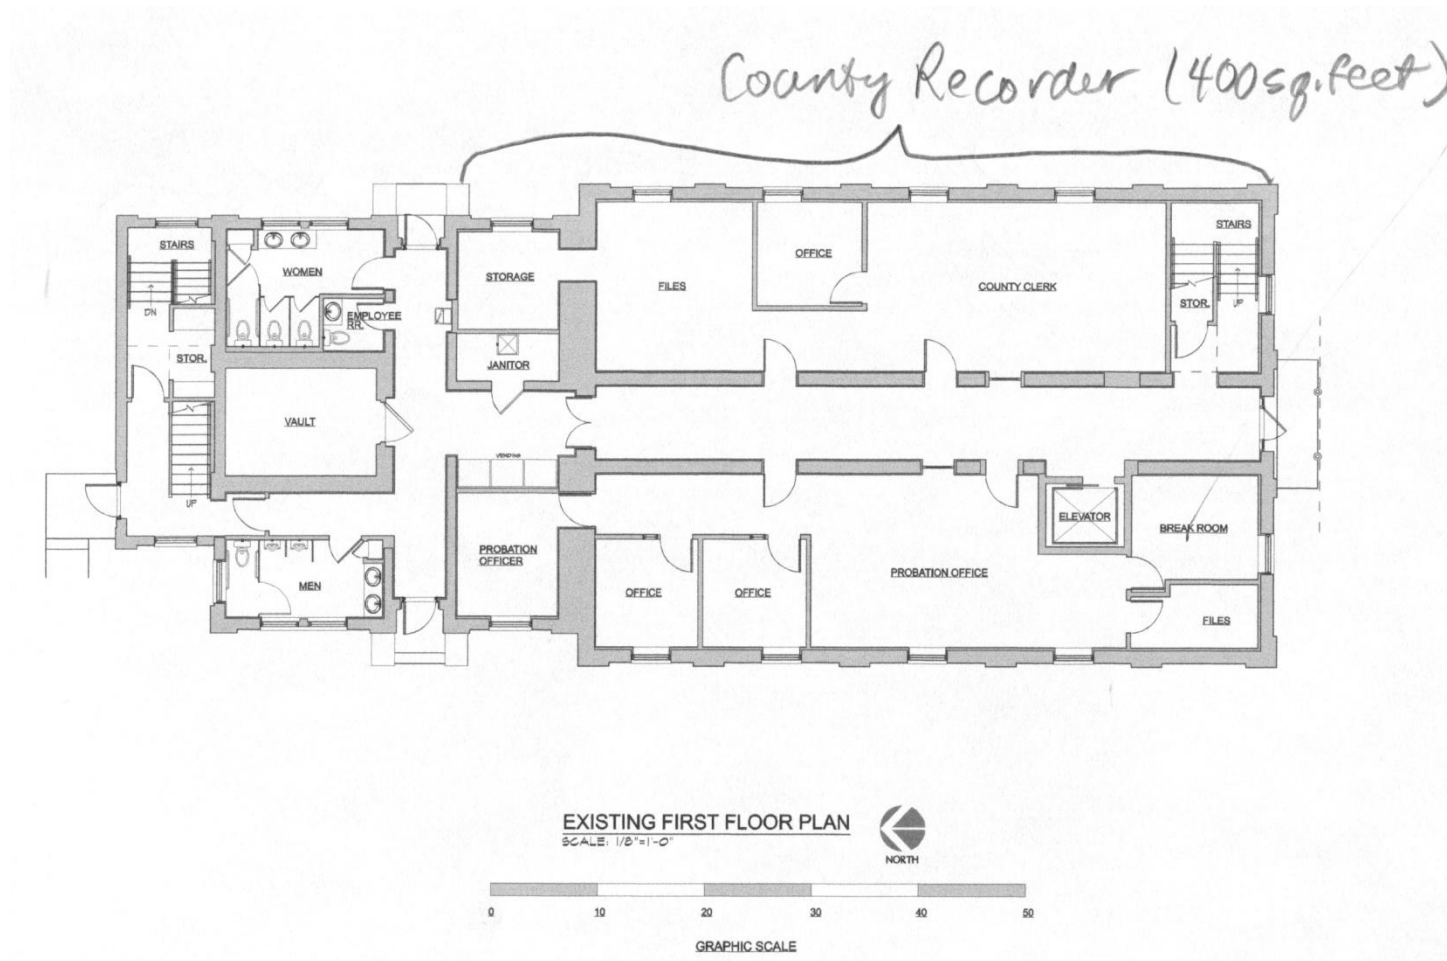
Existing first floor plan of Courthouse, showing space available for County Recorder.
